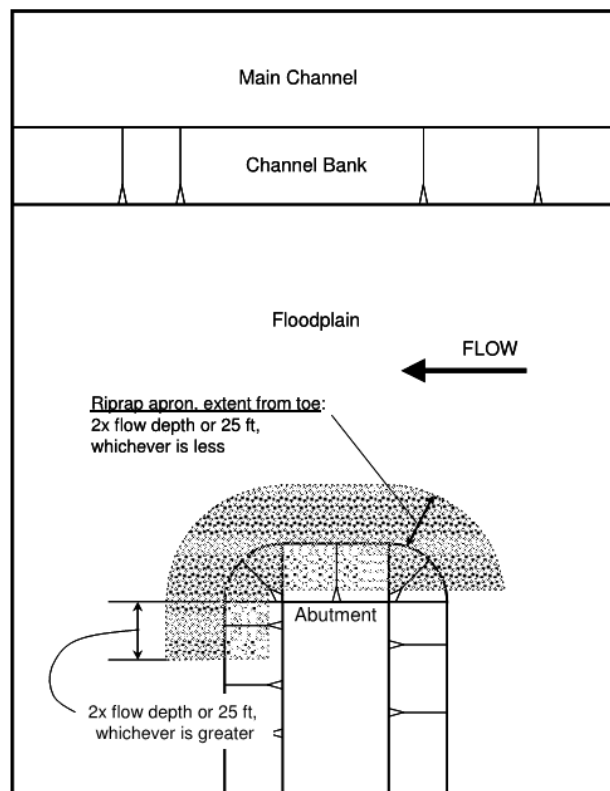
Plan view of the extent of rock riprap apron (Lagasse et al. 2006).
